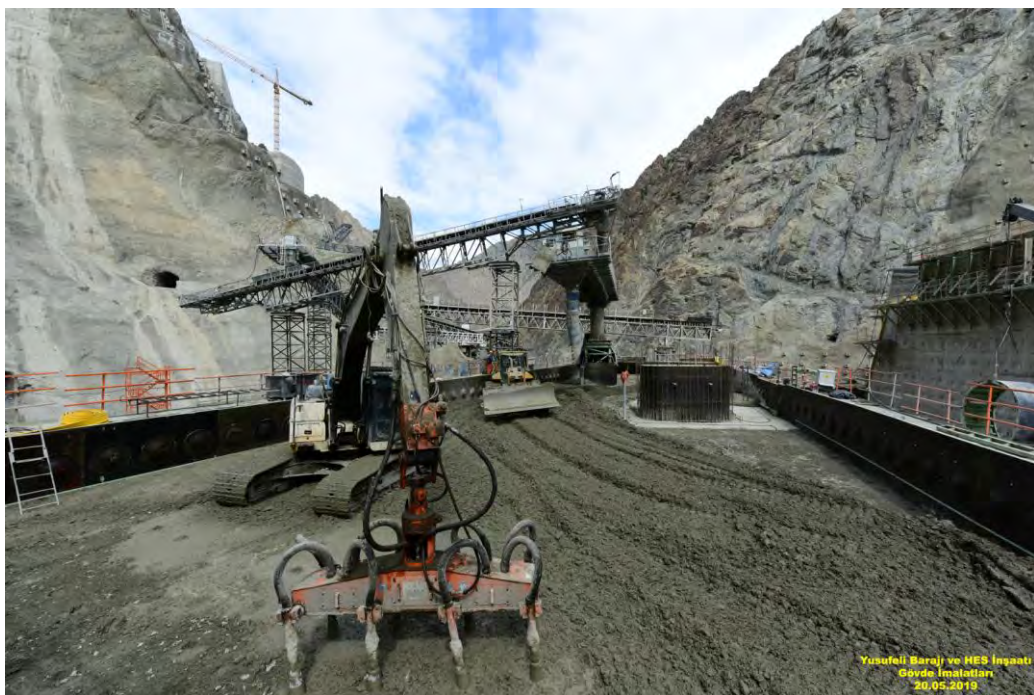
Spreading and vibration of freshly placed dam concrete
